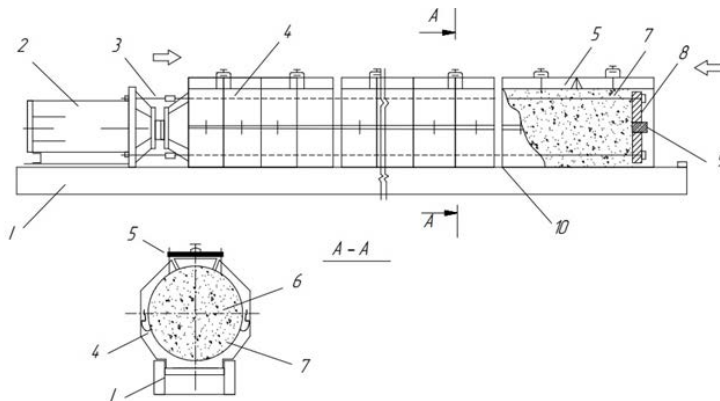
Scheme of compressing the pillar in the formwork according to the "during-tensioning" method 1 – frame, 2 – tensioning device, 3 – tie-rods, 4 – section formwork, 5 – functional joint, 6 – concrete mix, 7 – reinforced bar, 8 – movable end of the formwork, 9 – concrete cube sampling form, 9 – deformation seams
